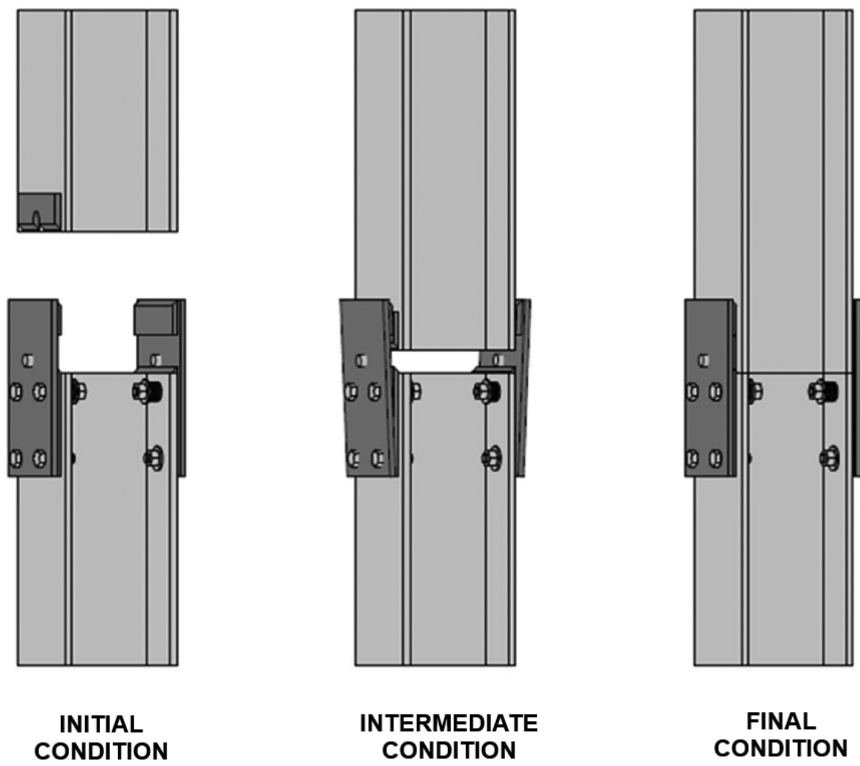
Initial, intermediate, and final conditions for the snap-and-lock assembly.
